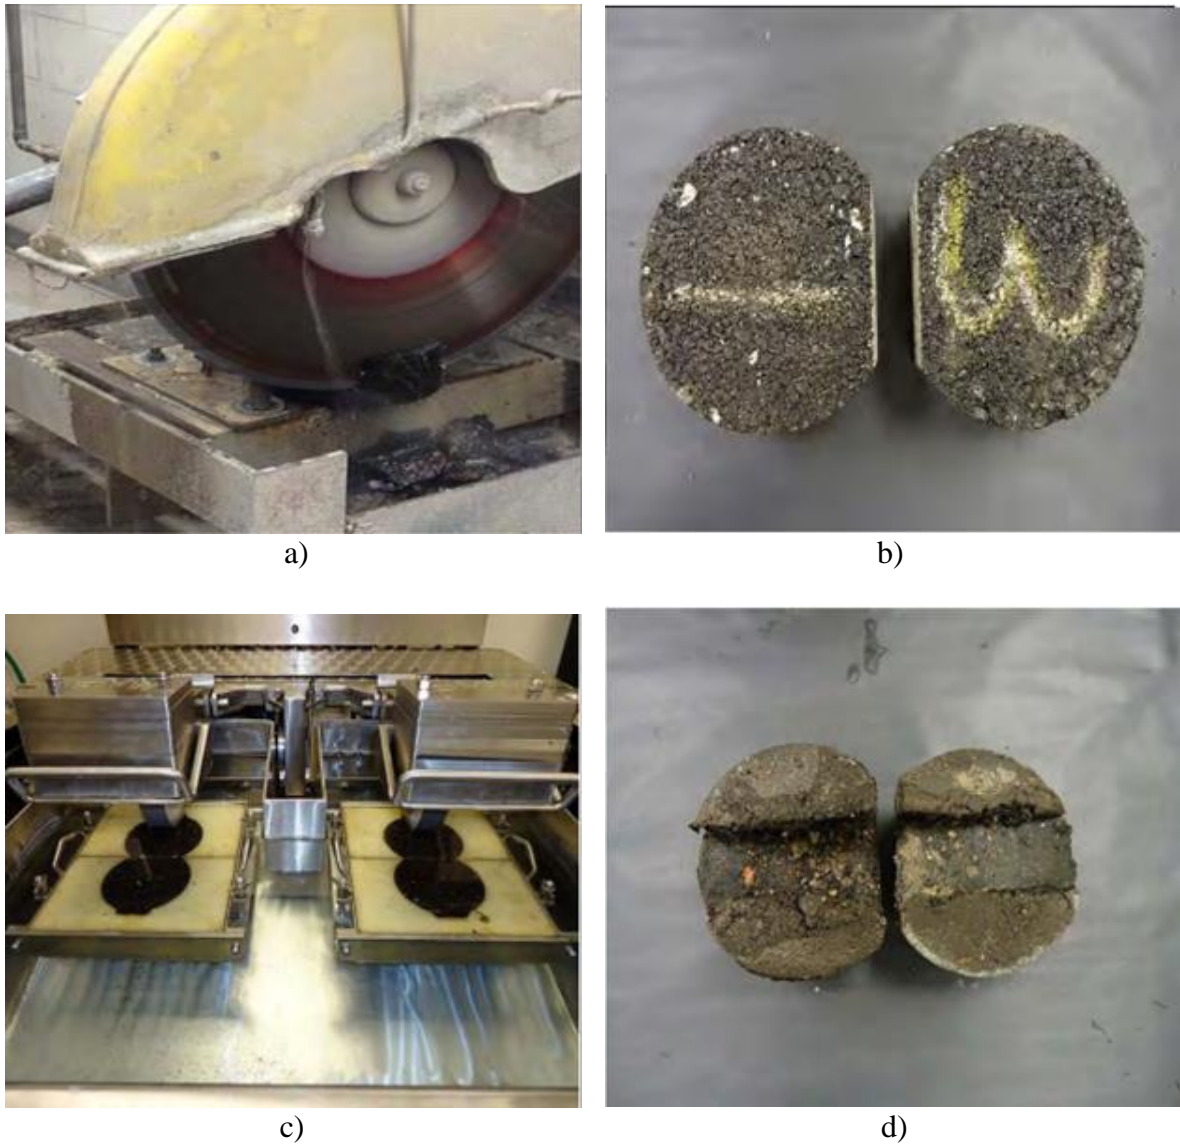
Testing stages: a) Sample is cut along the edge of the mold; b) Vertical-cut sample; c) Spicements placed in molds and mounted in tray; d) Failed sample (rut depth >20 mm)
